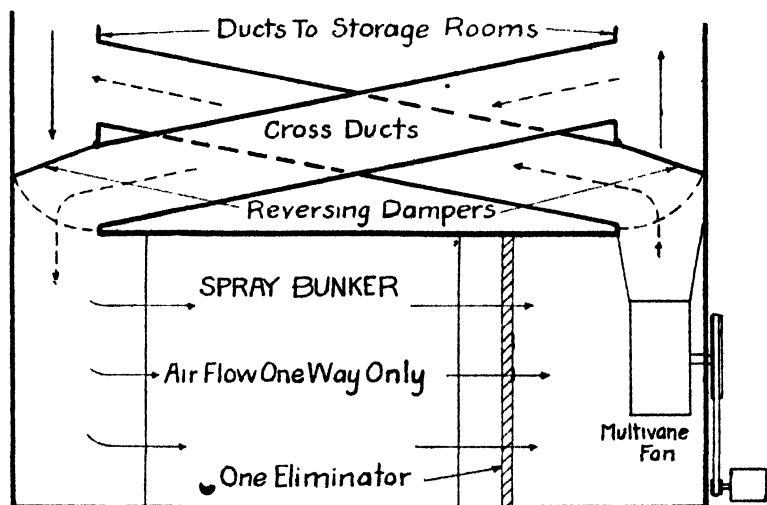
Reversing the air flow through cold storage rooms by means of cross ducts and dampers. Ground plan of bunker room and ducts to cold storage rooms.
